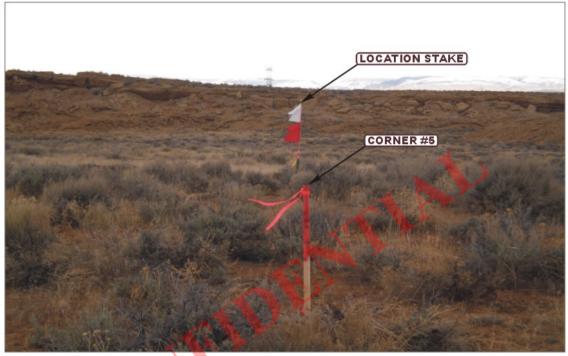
PHOTO: VIEW FROM CORNER #5 TO LOCATION STAKE
